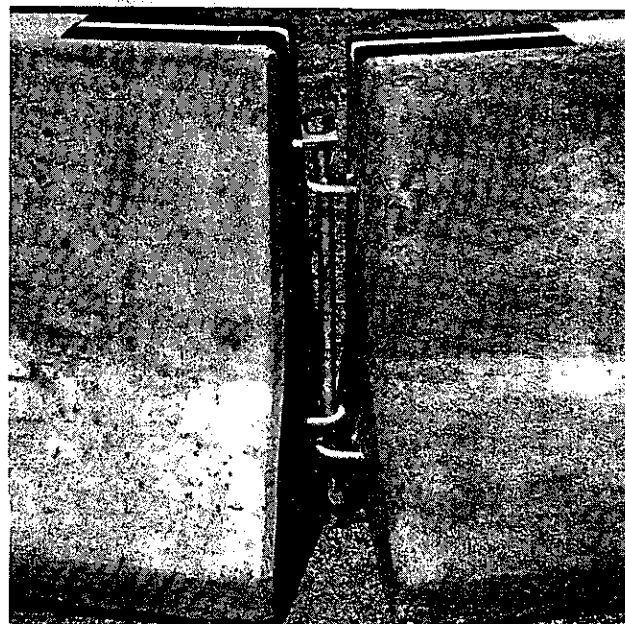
, Concrete Spalling at Joint 6 (first joint downstream from impact) Test 292
